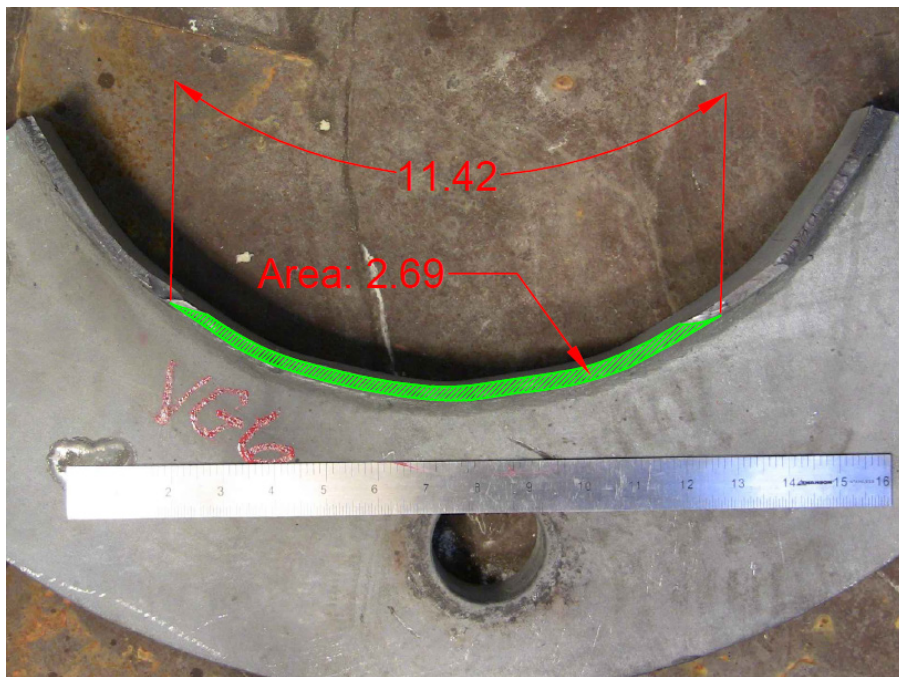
Photo. Specimen 2G3 fracture surface.
